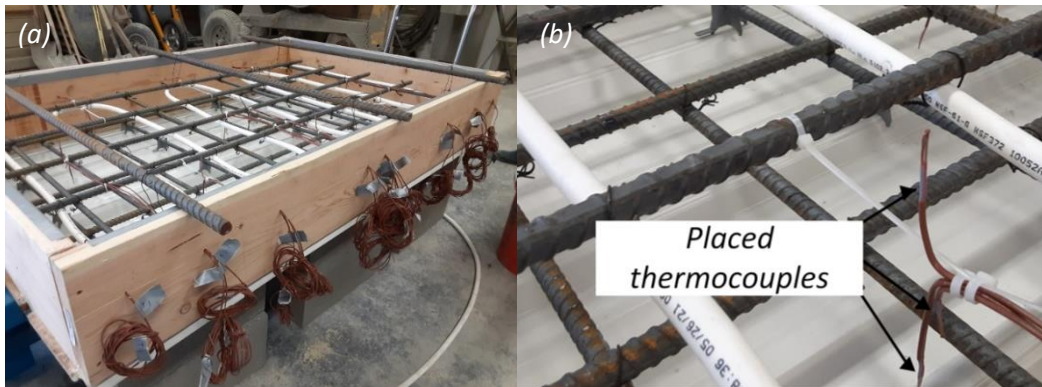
a) Completed form with thermocouples and b) closeup of placed thermocouple
